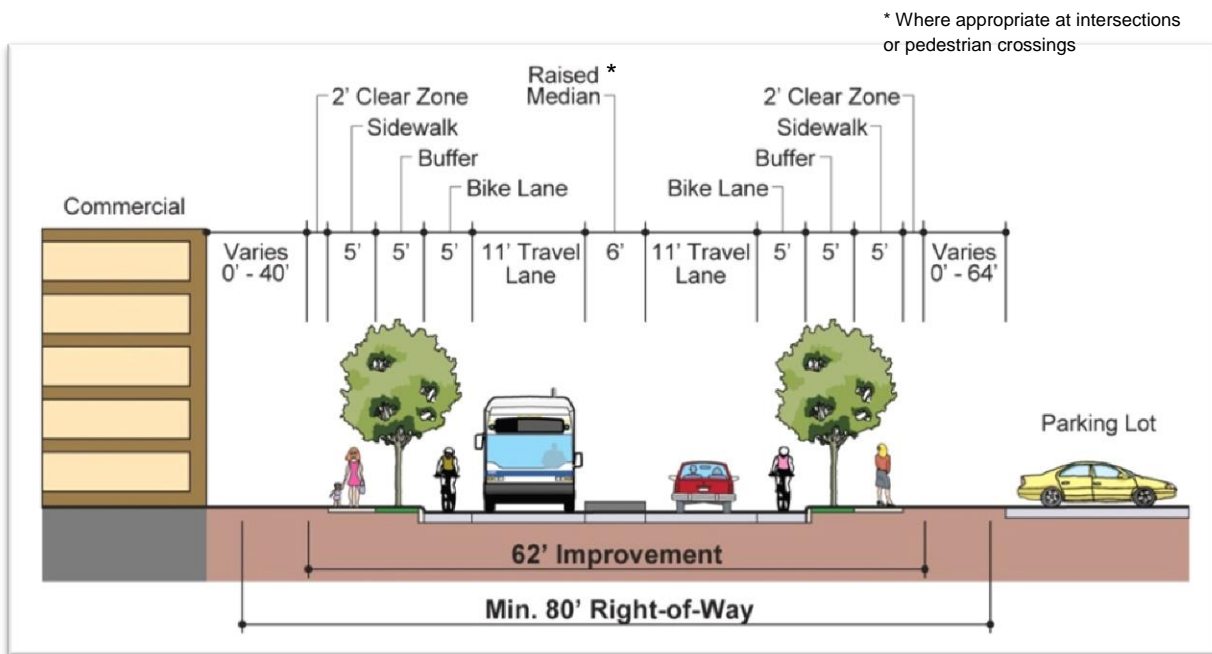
Typical Section from the rail overpass to Camp Meade Road (MD 170) – (Segment 1)
